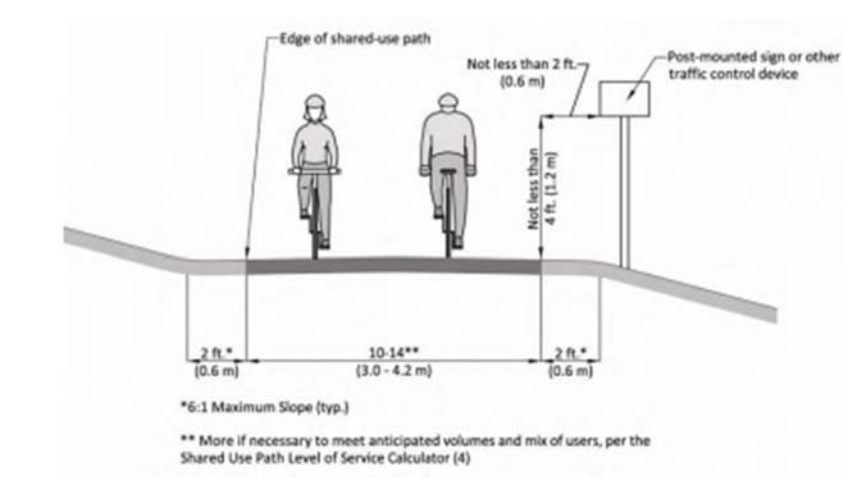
Example Separate Pathway Cross Section from AASHTO Guidelines
